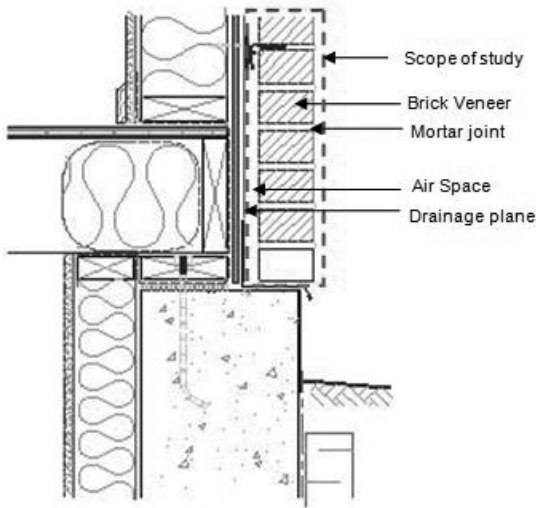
Typical Section- Brick Veneer wall at foundation showing scope of study. Source: (Wood frame envelopes 2001)
